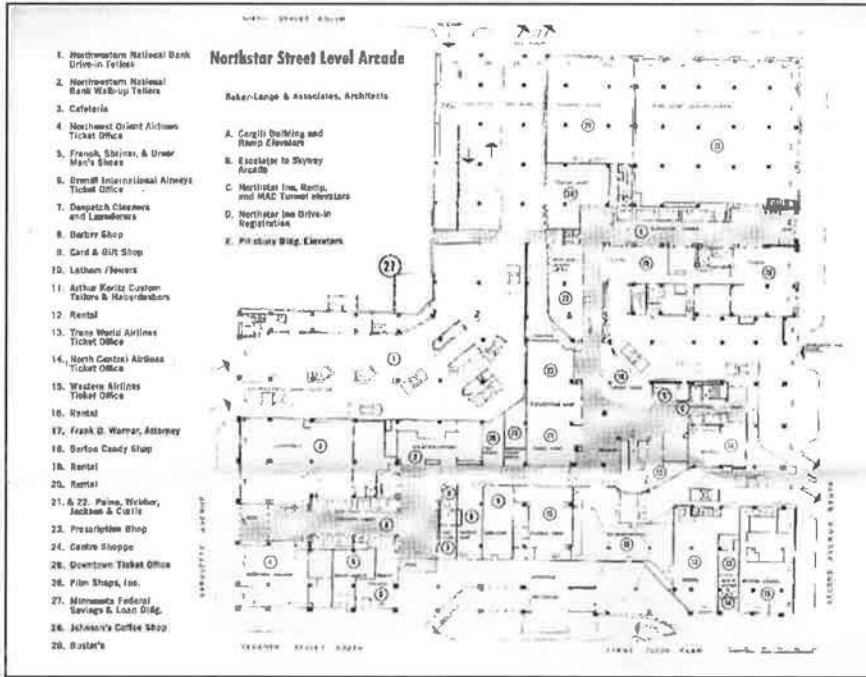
Diagram of the first-floor retail arcade at the Northstar Center, showing the connections between each of the buildings and the parking garage.
